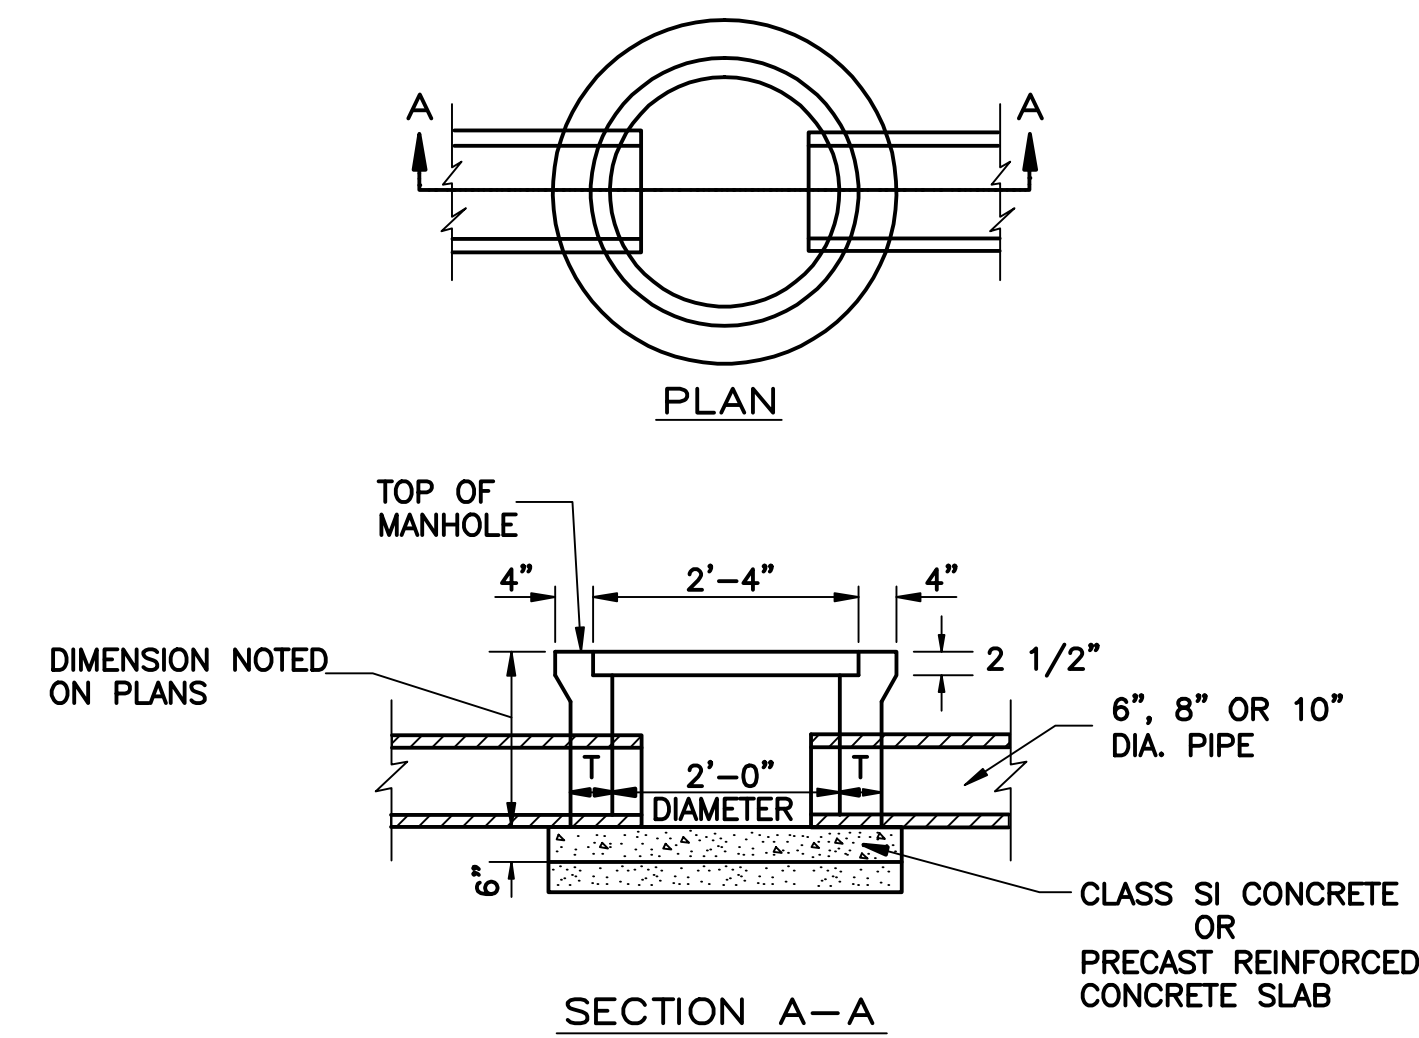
DETAIL OF PIPE UNDERDRAIN / FIELD TILE OUTLET INTO STORM SEWER OR PIPE CULVERT
